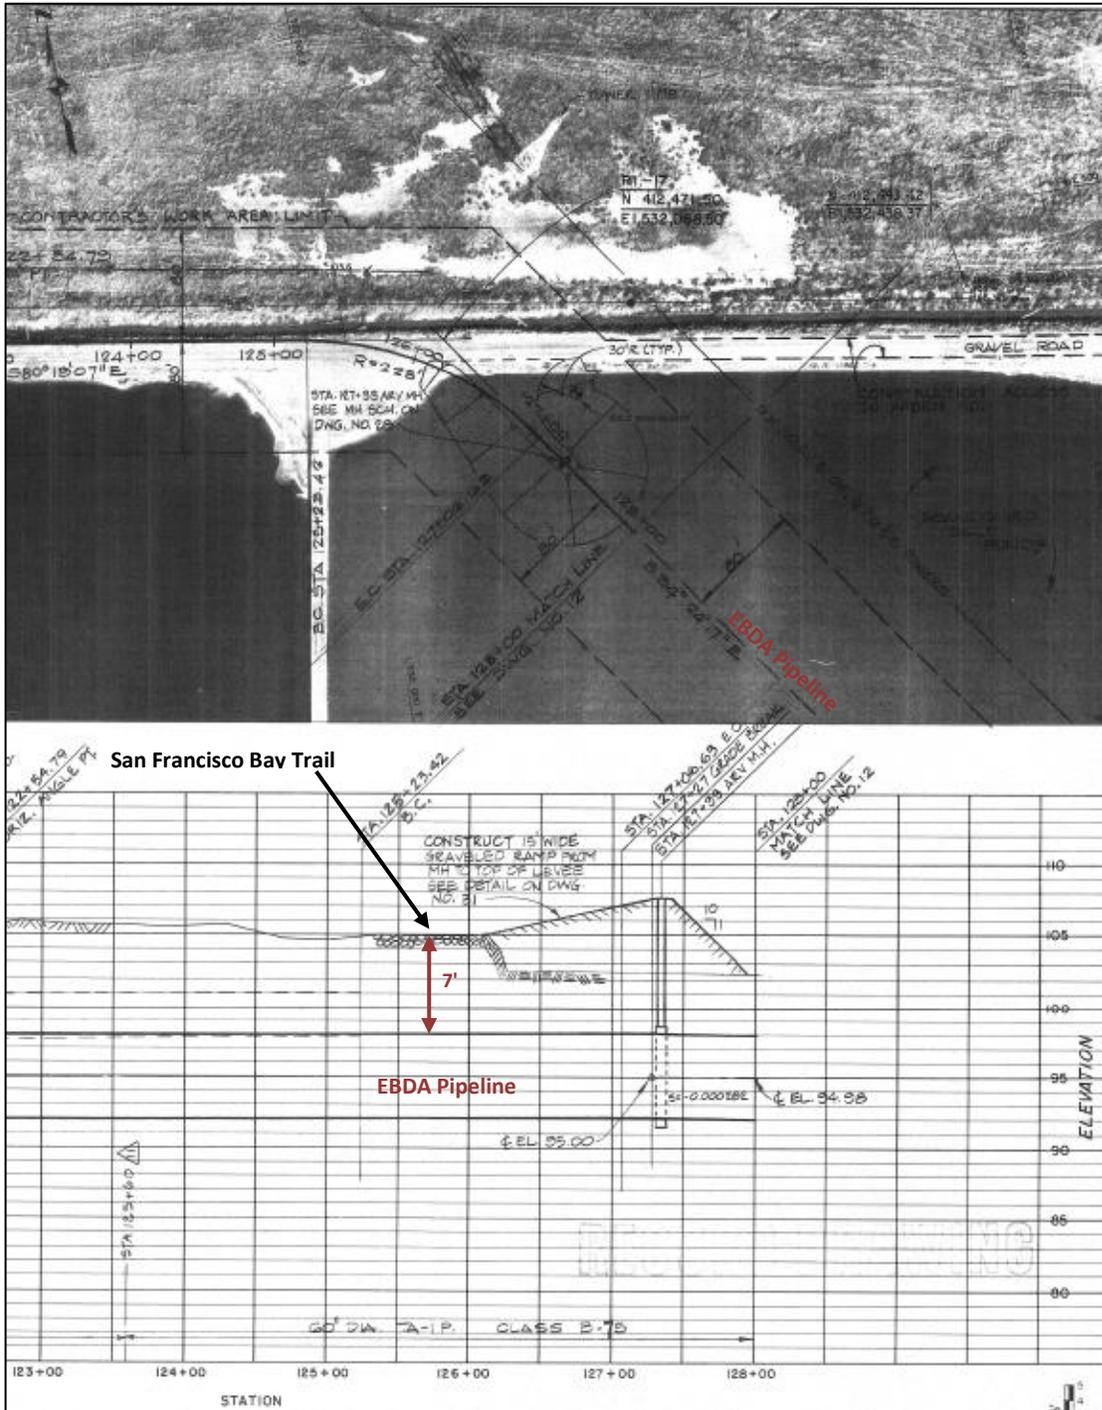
Excerpt from 1977 EBDA Transport Pipeline Force Main Plan and Profile Pipeline crossing under the San Francisco Bay Trail at Station 126+00, approximately 1,700 feet east of Eden Landing Road parking lot.
